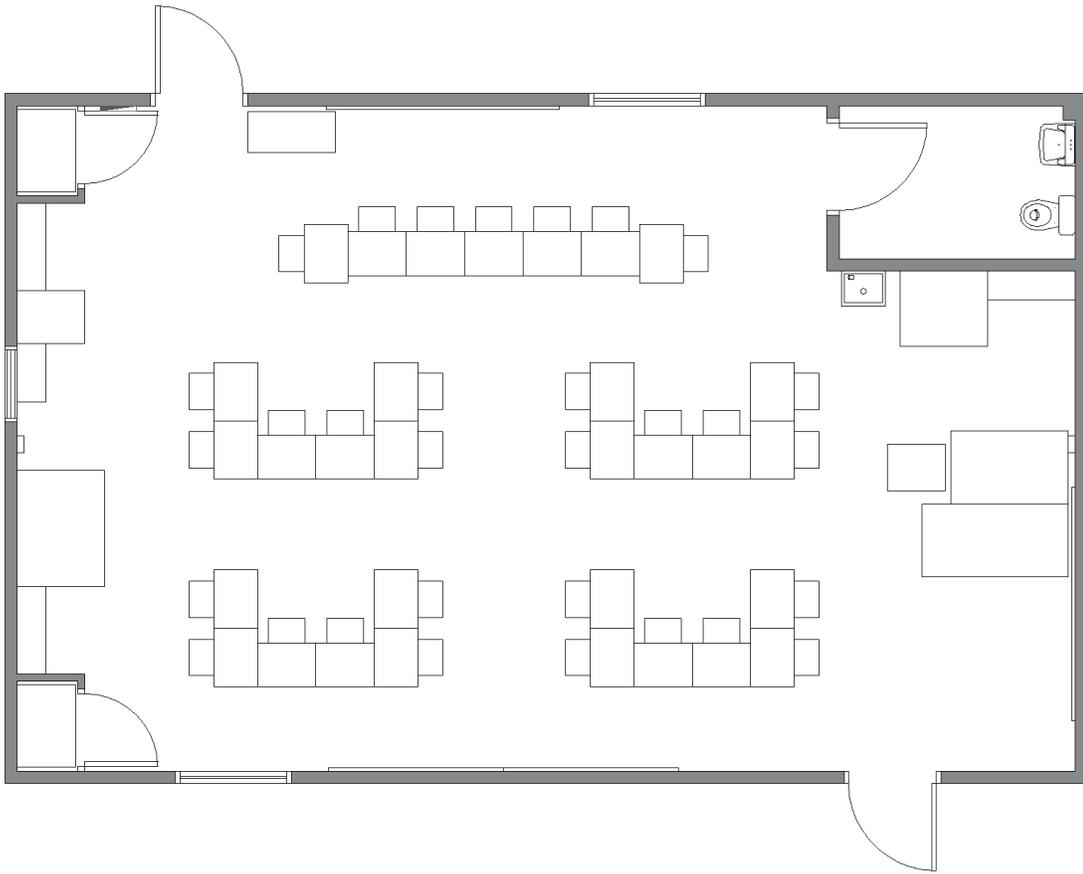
Typical Furniture Plan of Fifth-Grade Classroom
